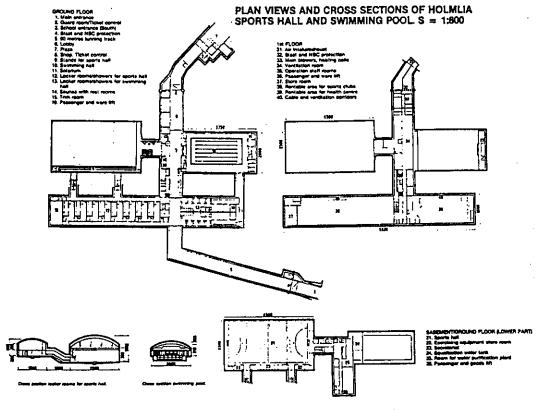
Plan view and cross-section of Holmlia sportshall and swimming pool.
